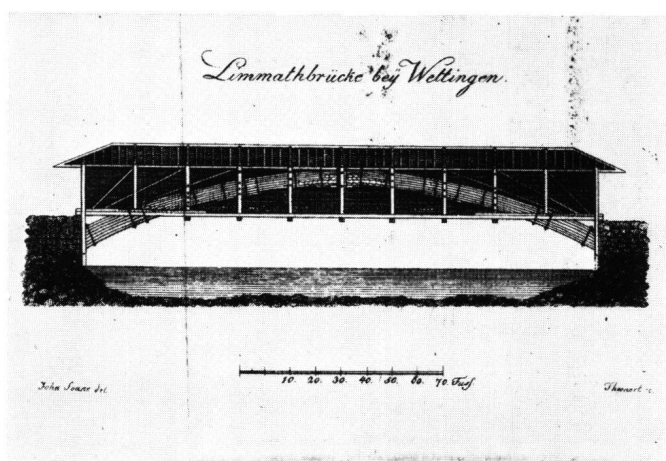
Bridge at Wettingen; print after John Soane showing elevation
